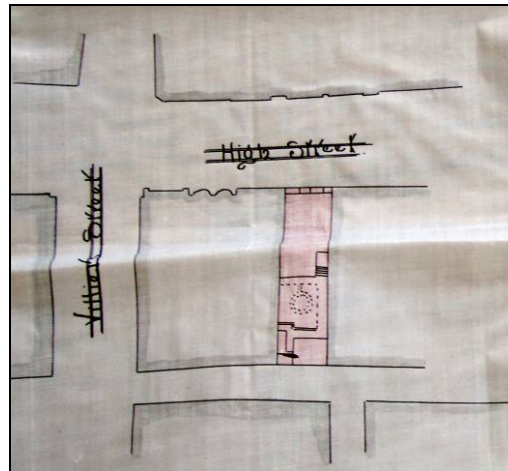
Building control plan of proposed shop layout 171 High Street West
